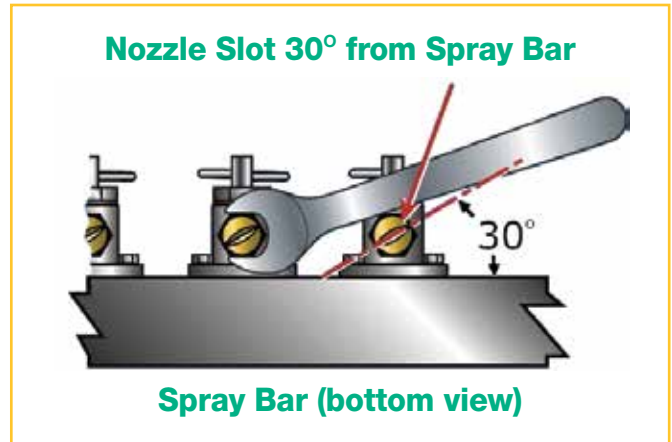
Spray Bar Wrench for Setting Nozzle Angle
